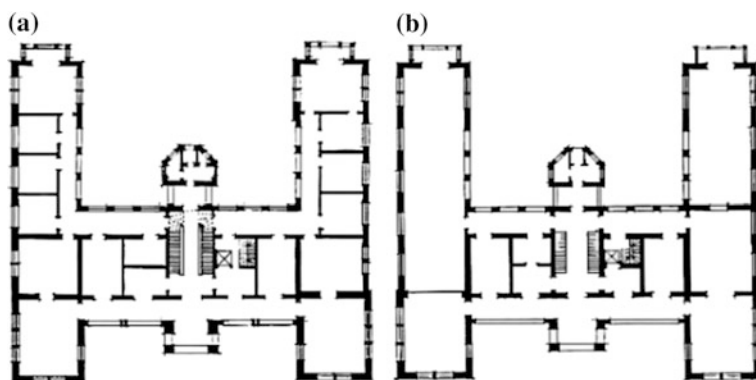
Pavilhão Mourisco's second-floor (a) and third-floor (b) plans, respectively
